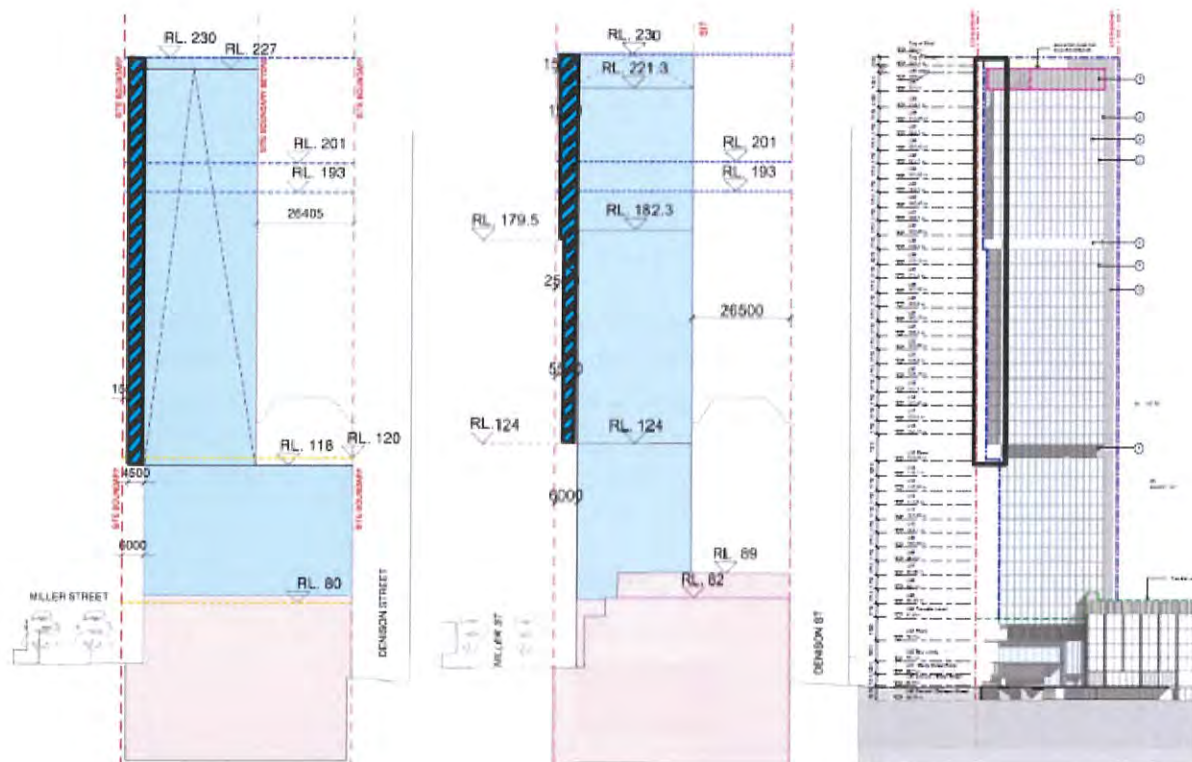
| Approved building envelope (left), proposed building envelope (middle) and proposed south elevation (right) with Miller Street setback non-compliance hatched (Source: EIS)
